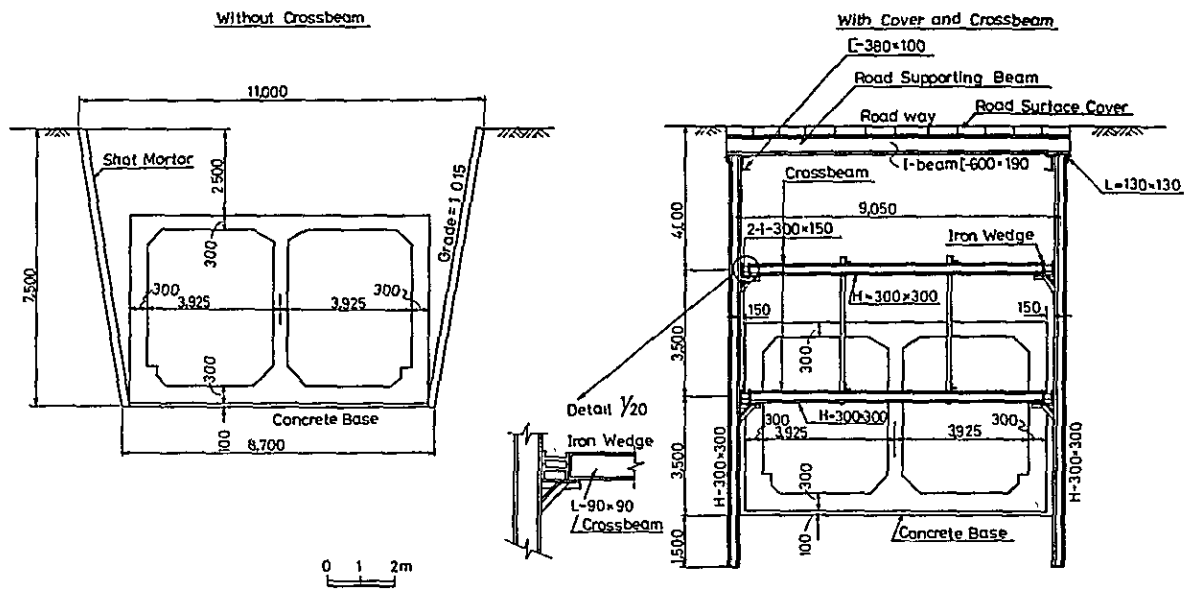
Standard open cut excavation method used in Tokyo
